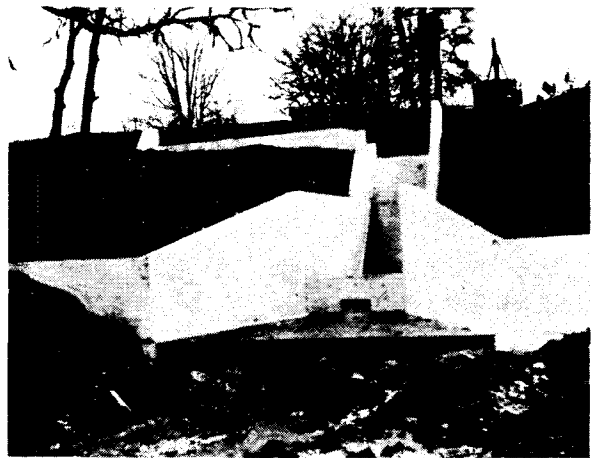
Stilling pool and outlet portions of a spillway structure. Control built into the stilling pool maintains tailwater for the hydraulic jump. P-833-128-70
